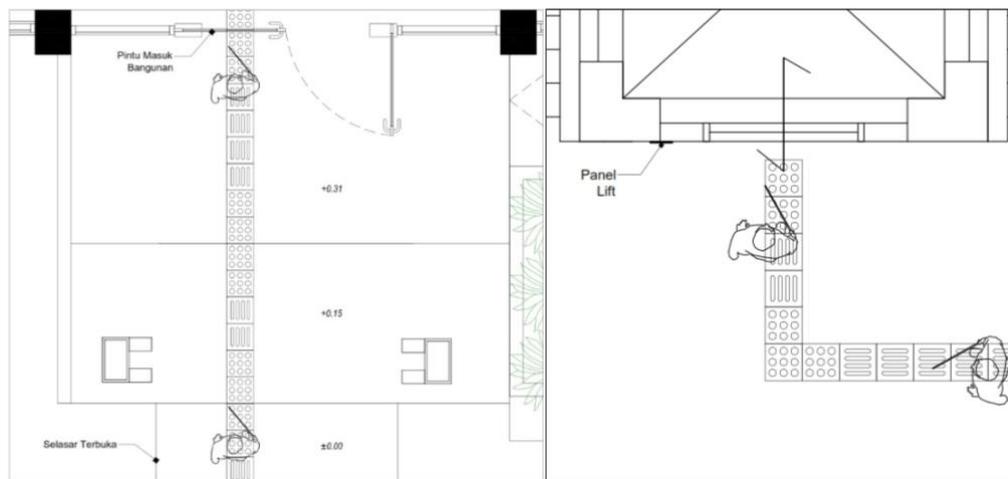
Tactile pavings on the stairs and building entrances Figure 18: Tactile pavins on the building elevator entrances
